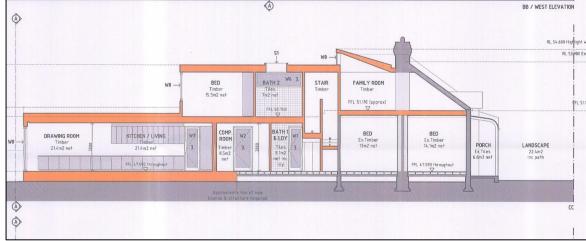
Approved first floor addition to No.169 Darley Road, resulting in loss of the roof formation (DA/508/2011).
